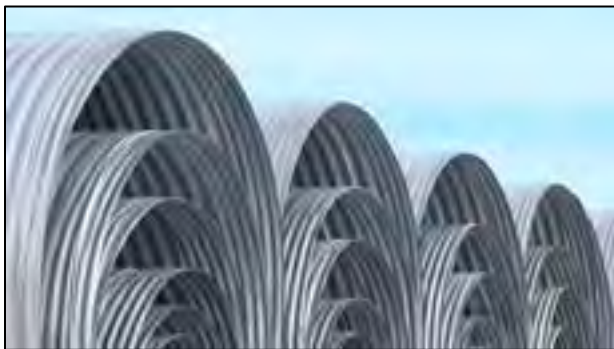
Examples of pre-cast concrete and pre-formed metal structures.
